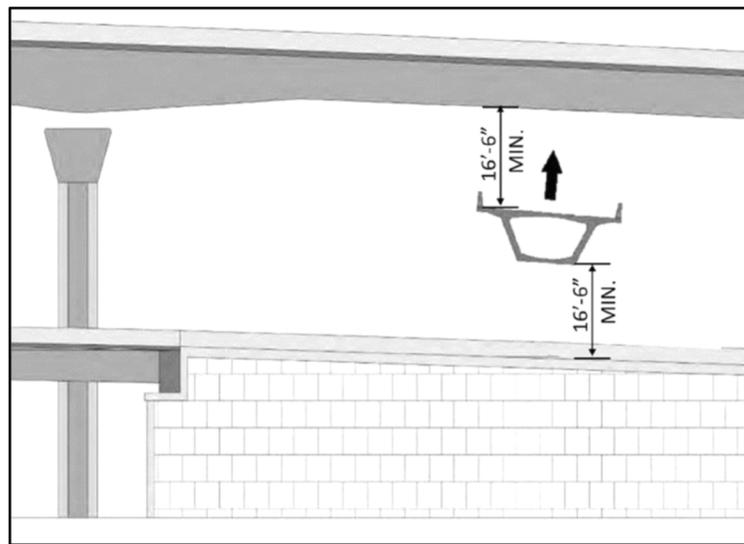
Bridge 9 Between a 2nd and 3rd Level Flyovers
